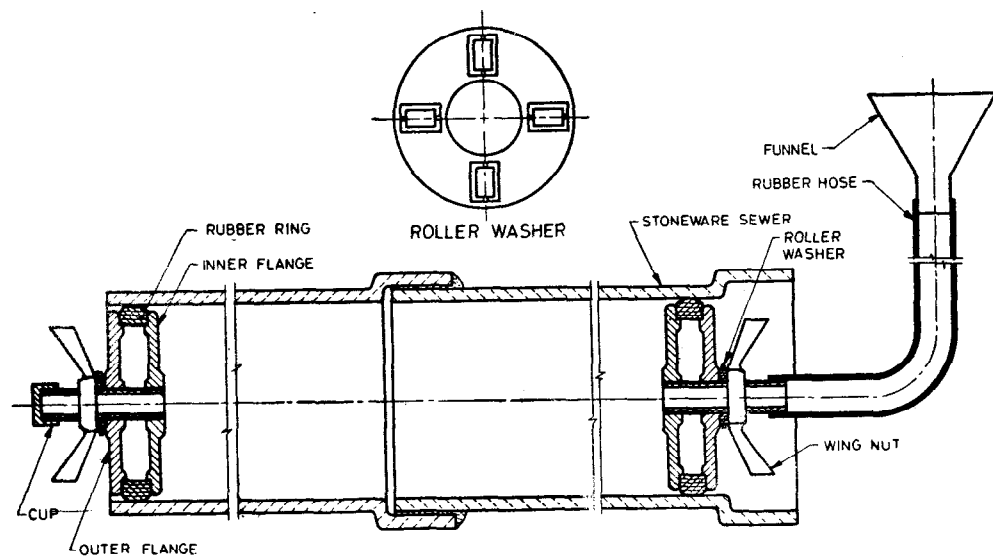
TYPICAL ARRANGEMENT FOR HYDRAULIC TEST OF SEWERS
